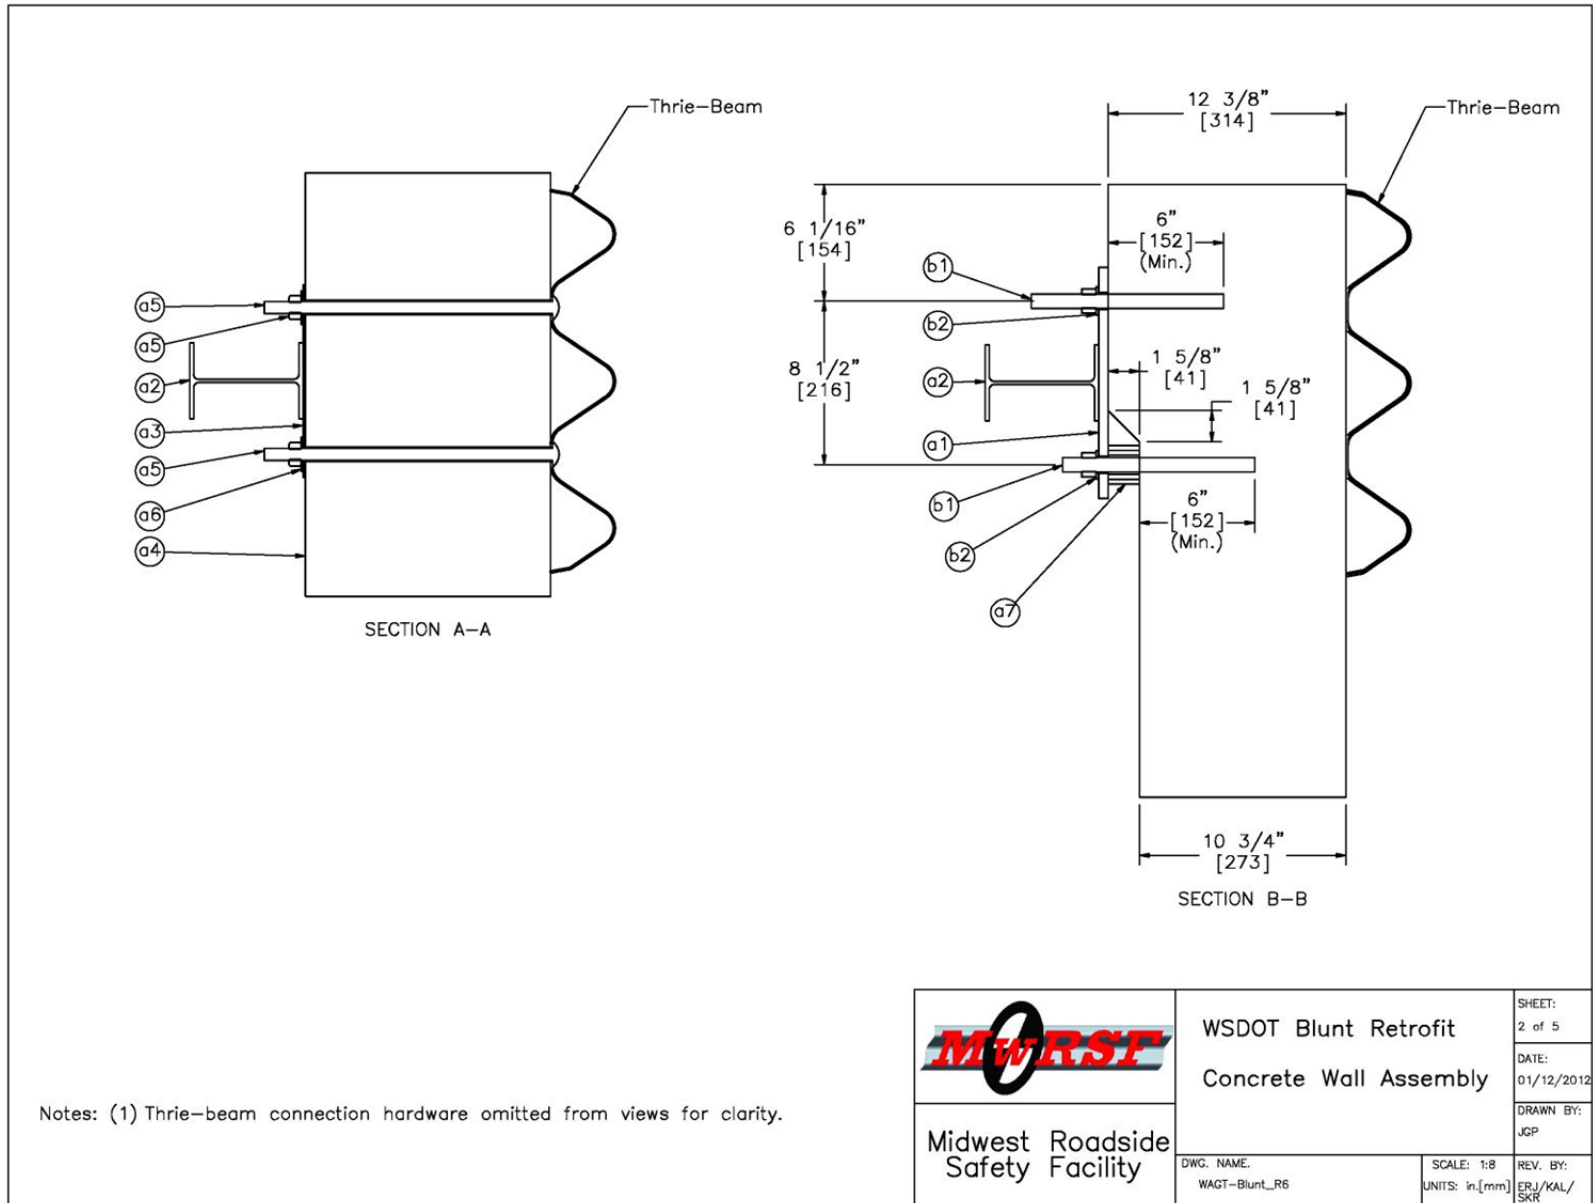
Retrofit 2 – Blunt-End Concrete Wall Assembly – Side View
